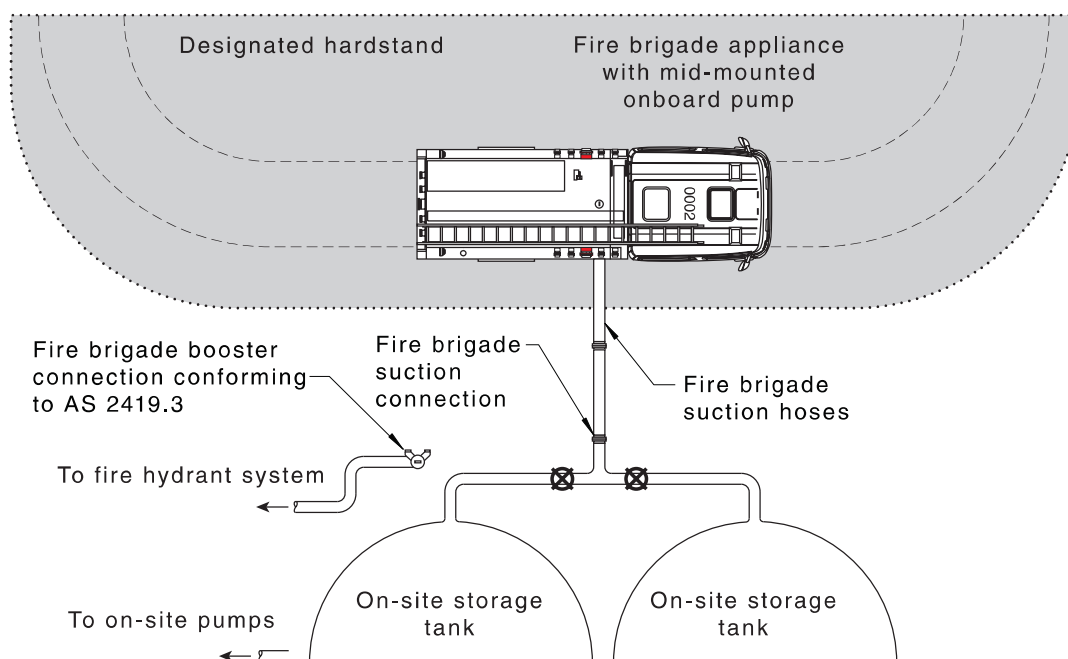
(B) — Mid-mounted pump, draughting from on-site storage tank
